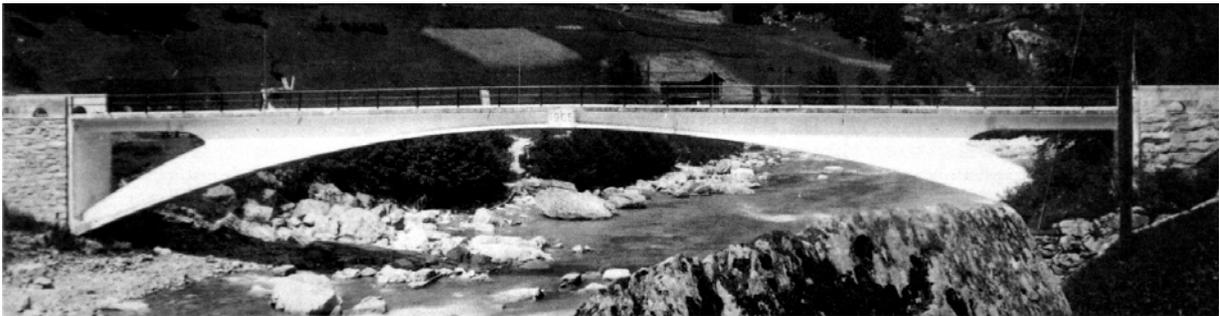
Tavansa Bridge, 1905. Maillart's improved box section design with material removed from areas of spandrels where cracking was observed in the Zuoz and Bilwil bridges. (Billington¹)
